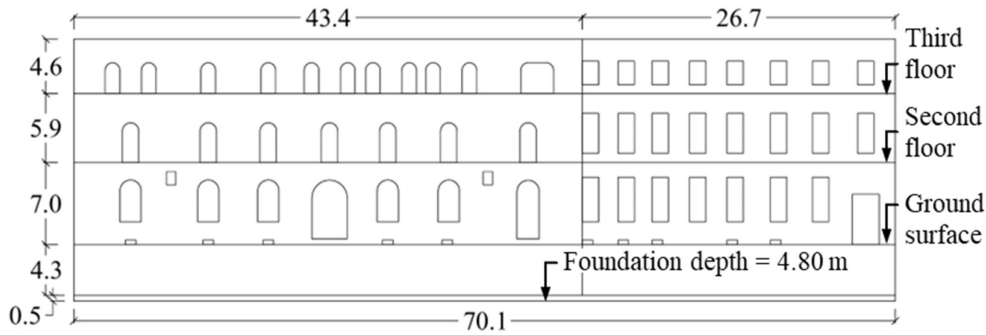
NORTH facade. Simplified exterior elevation, Via Principe Amedeo wing
